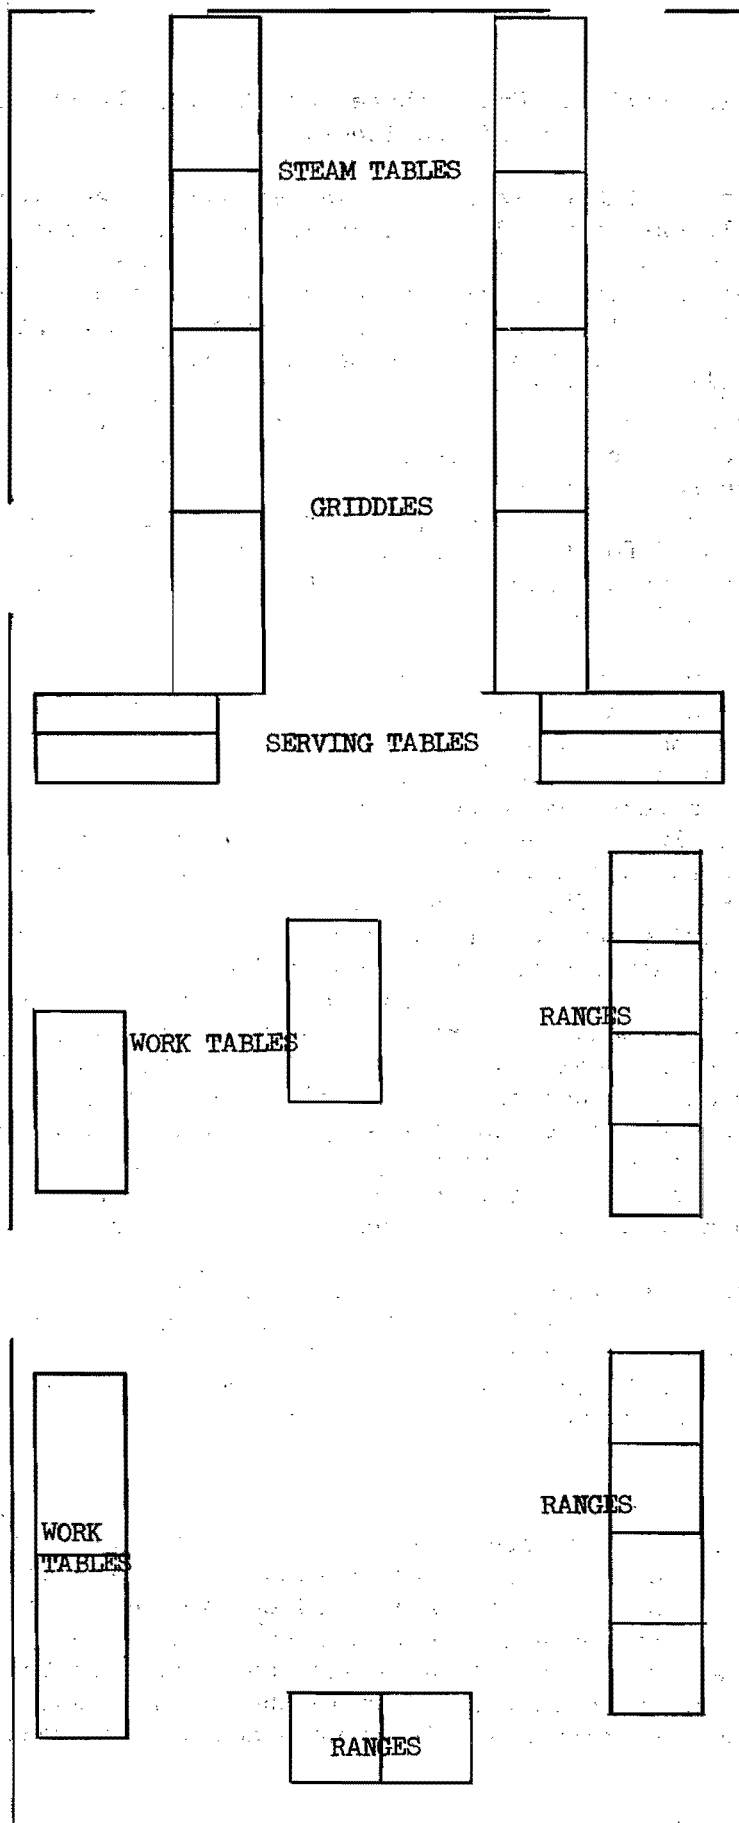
XM-75 Kitchen Layout (16' x 40' Shelter)
